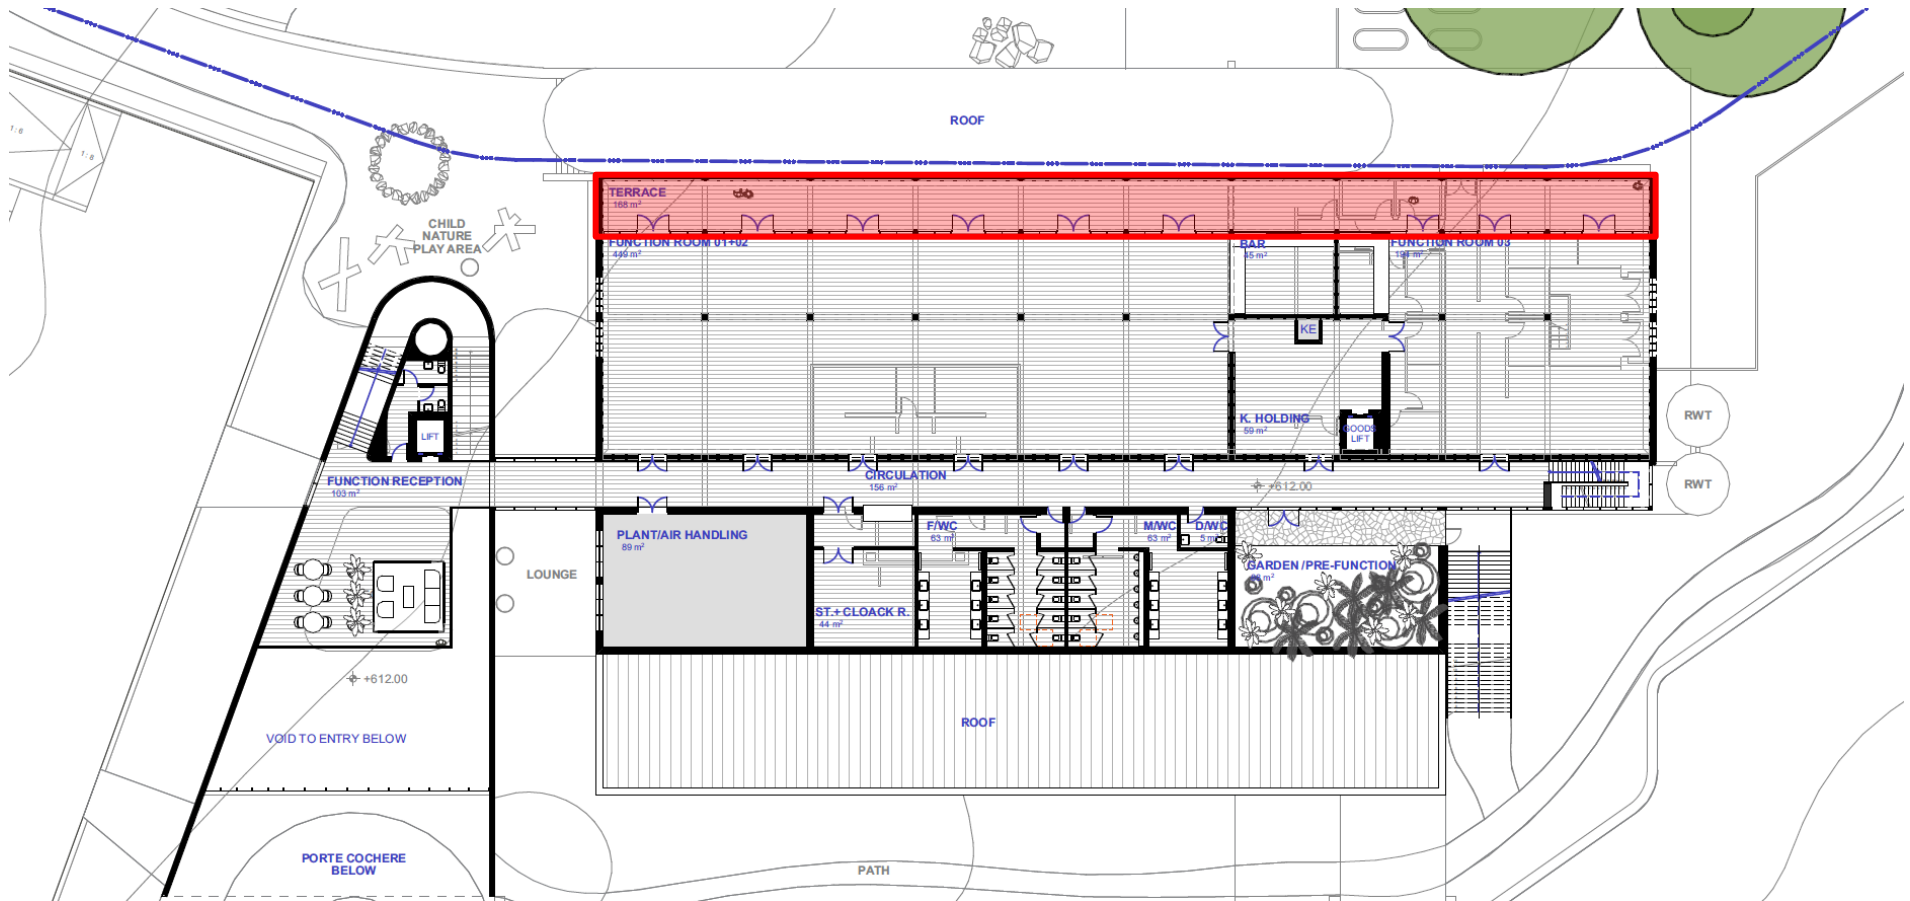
Proposed Outdoor Areas - Level 1 (Stage 2)
